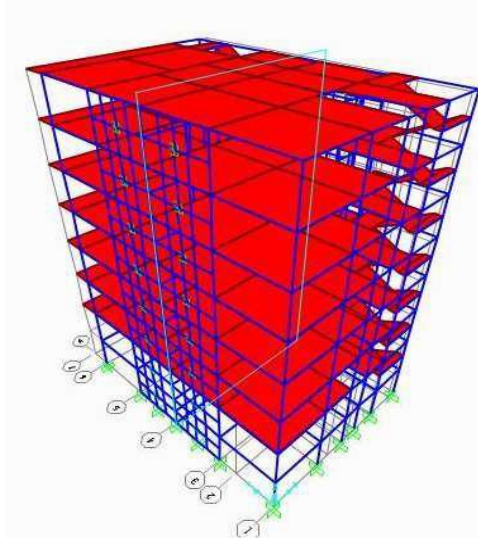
Model with dampers at interiors and without shear wall (SAP2000)
